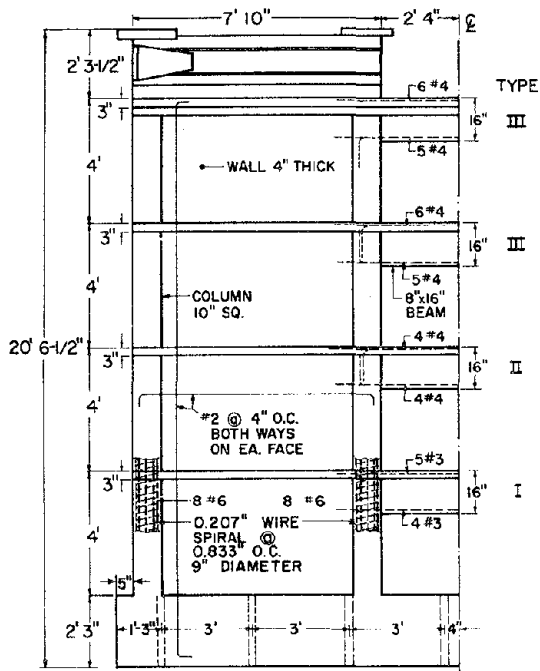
(a) DIMENSIONS AND DETAILING OF THE MODEL SUB-ASSEMBLY, FRONT ELEVATION
